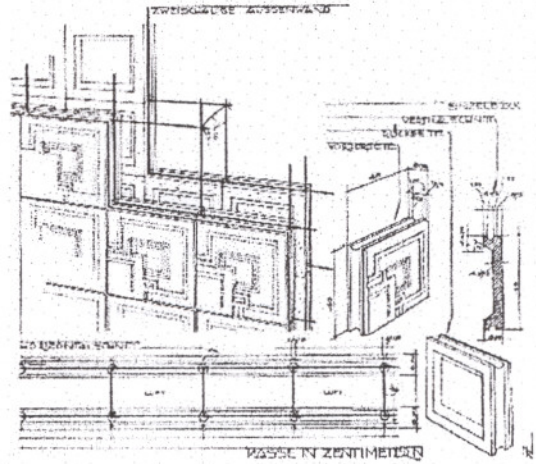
Wall detailing of Alice Maillard House, Wright, 1923; (source: Frampton 1995)
